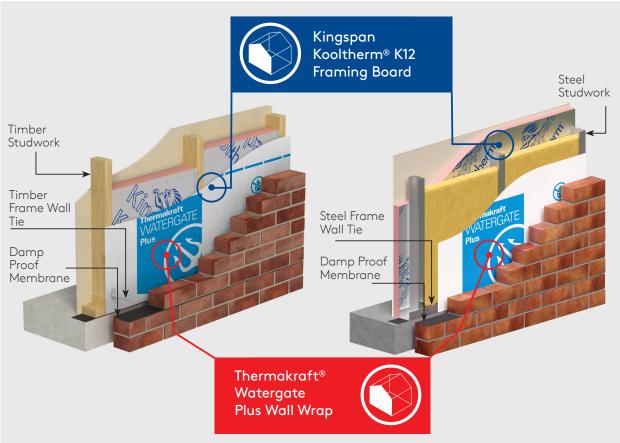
Kingspan Kooltherm® K12 Framing Board in between Timber Studs and Kingspan Kooltherm® K12 Framing Board as Continuous Insulation, Internally lined for Steel Frame.
